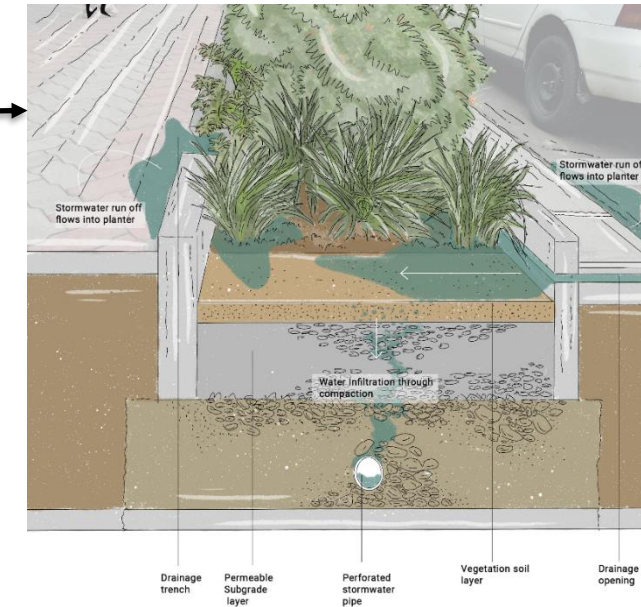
Overlay illustrating sketches of the proposed improvements to the Moi Road street tree planters, including stormwater integration and permeable pavement design
